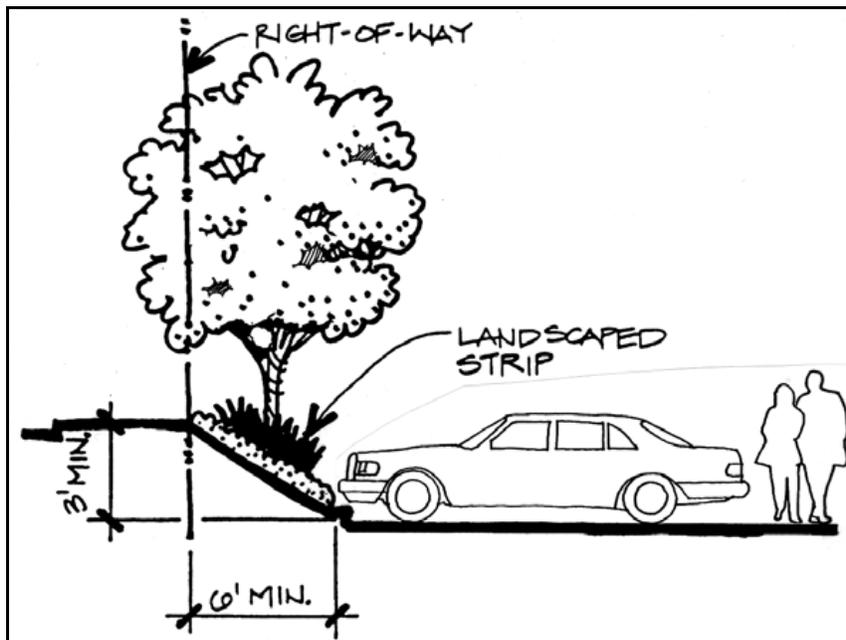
Parking Lot Landscaped Strip, Option 3
